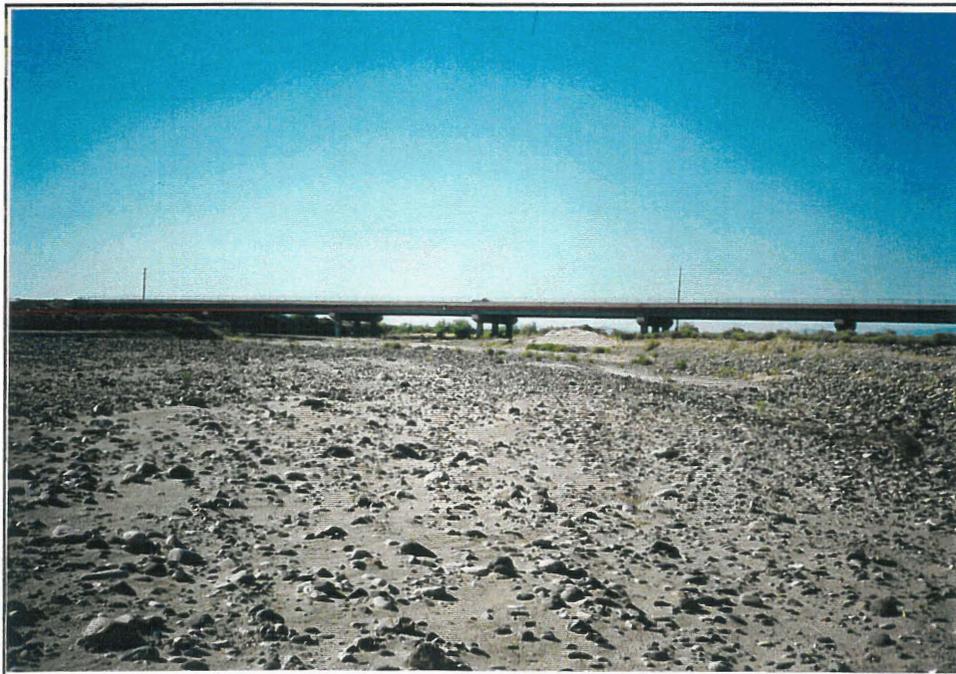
View looking upstream from channel toward west abutment. Note primary low flow channel trending toward center of main channel. Also note relatively steep channel slope.
